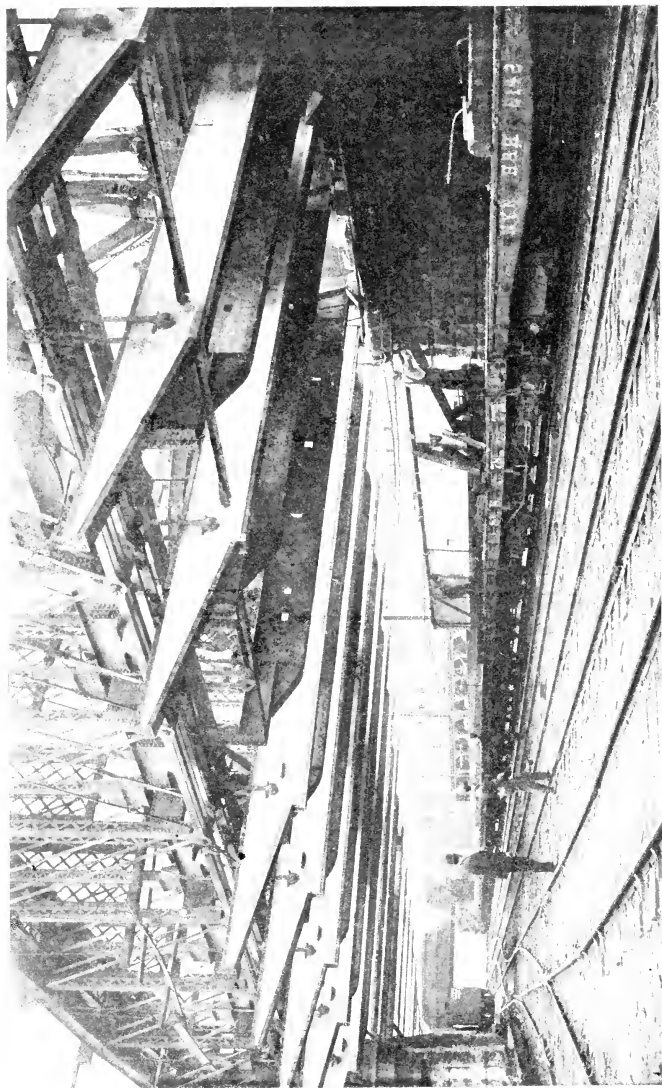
BOYLSTON STREET BRIDGE GENERAL VIEW OF BRIDGE FROM BELOW NEW CITY FLOOR BEAMS BEING PUT IN PLACE.
